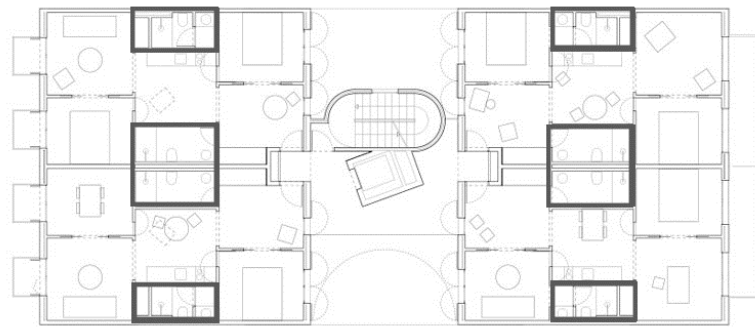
110 Rooms Dwellings Housing Block In Barcelona
